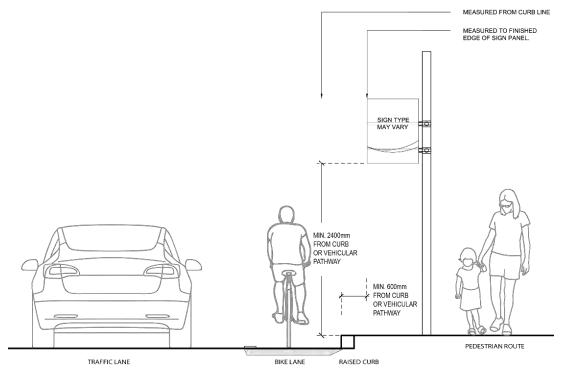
Urban Street & AT Route Signage Placement. Min. 600mm edge of sign to edge of curb. Min. 2400mm vertical clearance to bottom of sign
